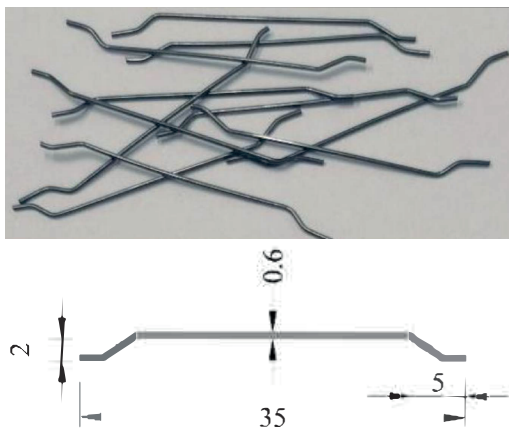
Hooked-end steel fiber, the dimensions are in millimeters
